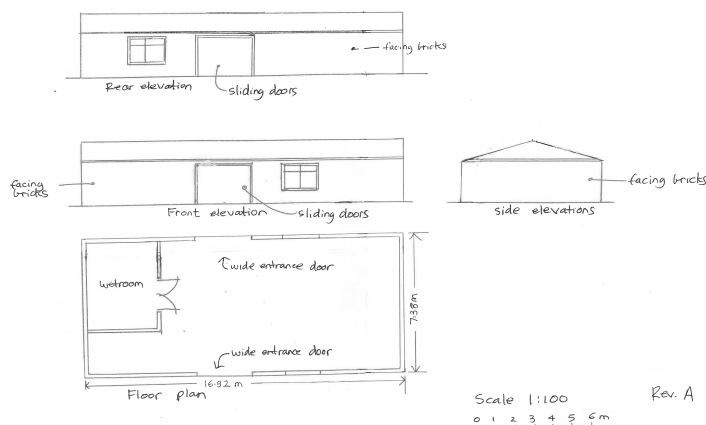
Proposed Plans and Elevations of application ref. 17/504435/FULL
